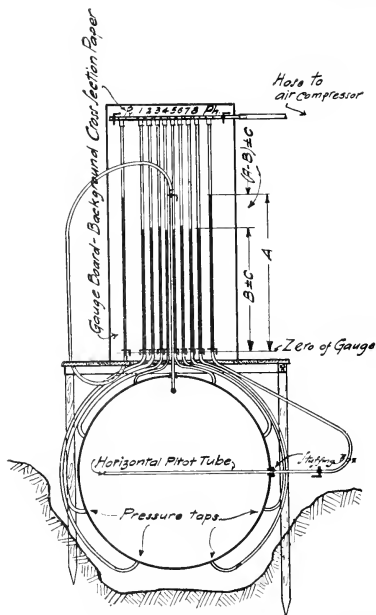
Elevation of Gauge Board, Penstock, Pressure Tubes and Pitot Tubes.
